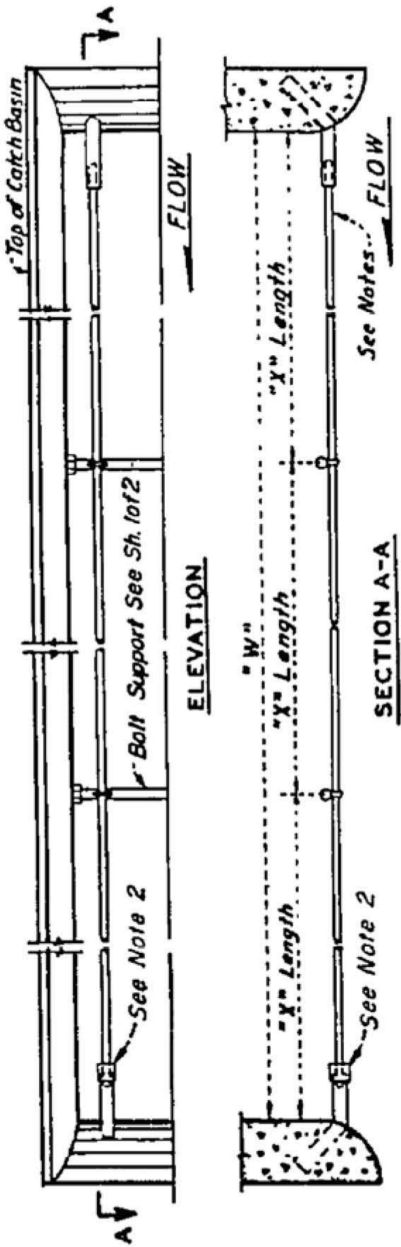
DETAIL OF CATCH BASIN OPENING & INSTALLATION DETAILS
